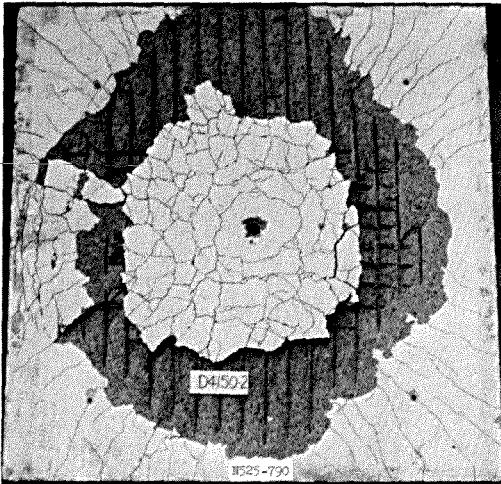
Posttest photographs of Specimen D4150-2 (Sheet 1 of 2).
